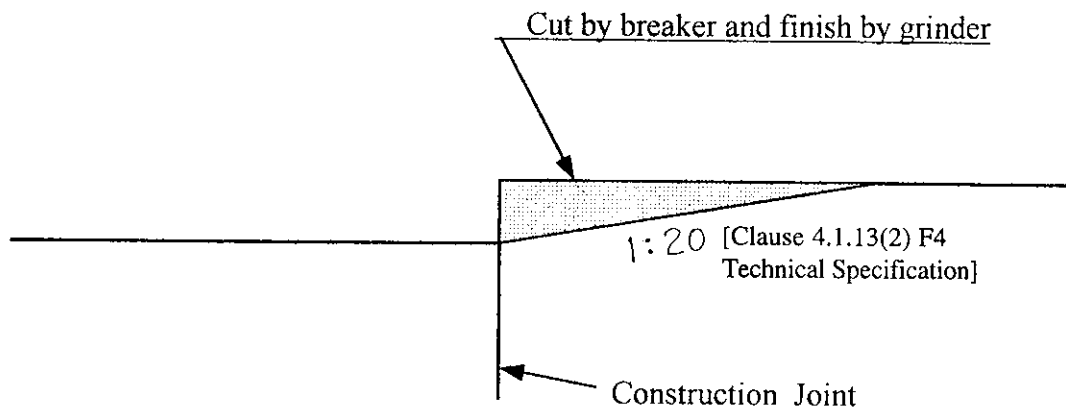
Method of Repair of Irrguralities at Construction Joints and at Where Inspection Windows of Steel Formwork Were Placed
